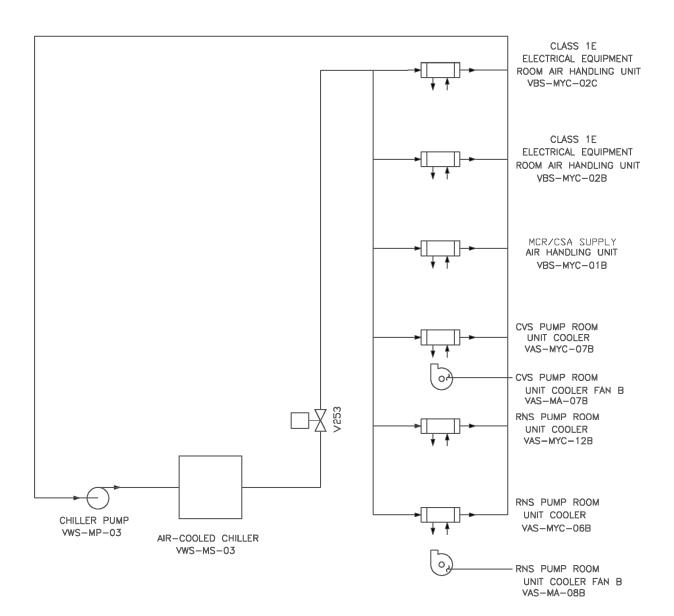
(Sheet 2 of 2) Central Chilled Water System
